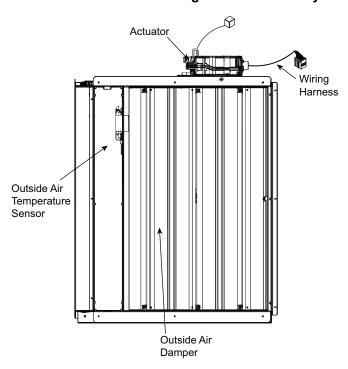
EconomizerONE Component Locations (CRECOMZR108A00 Shown)
